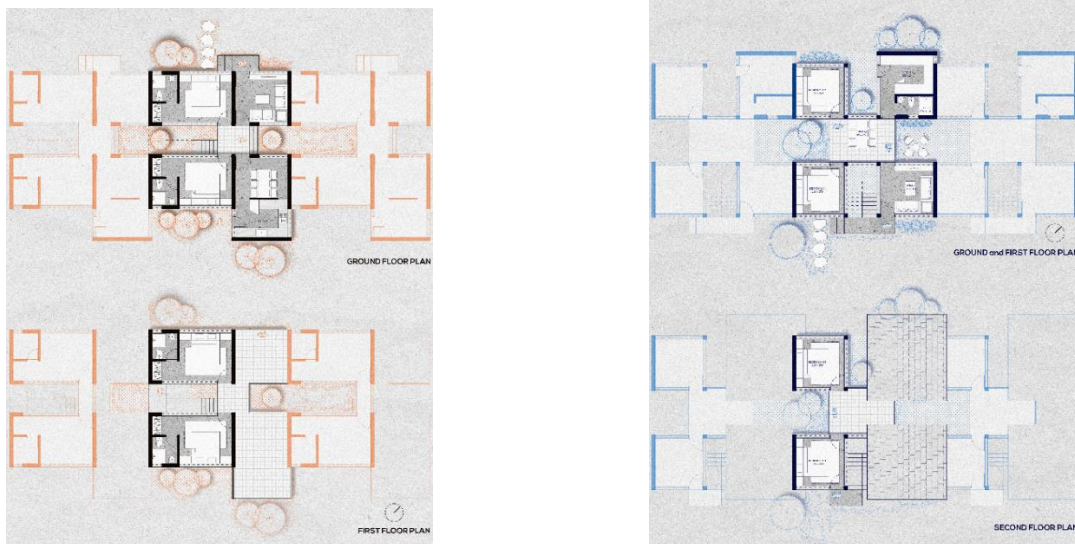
and 4.1.2 (Left to right) Type 01 plans and type 02 plans
